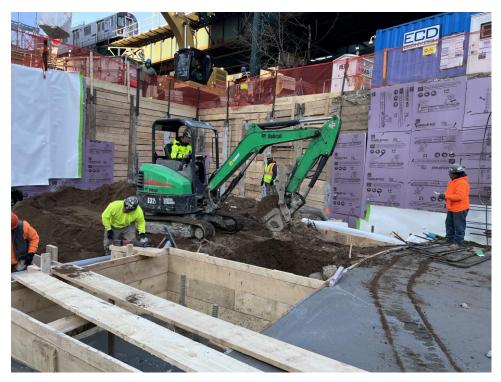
ECD excavating around a pile cap in WCG COMP A (facing southwest).
